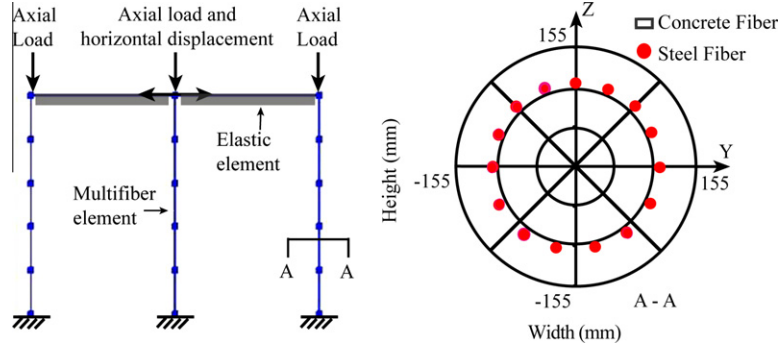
Bridge pier under cyclic loading: Multifiber discretization.
